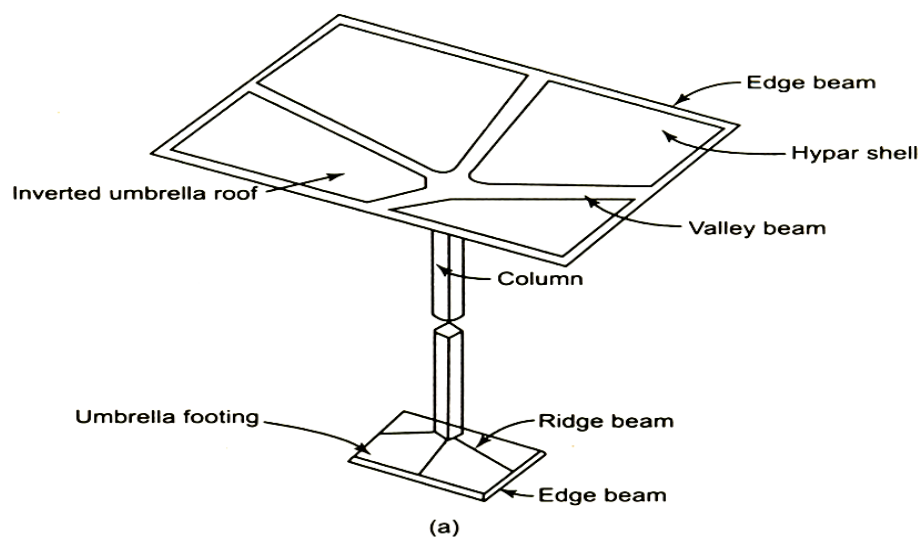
(a) Inverted umbrella roofs supported on umbrella footings
